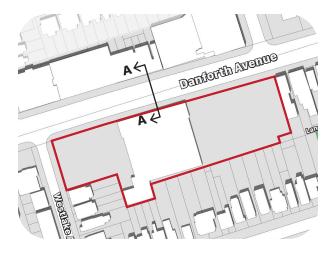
Existing Danforth Avenue Section Looking West (A-A)
